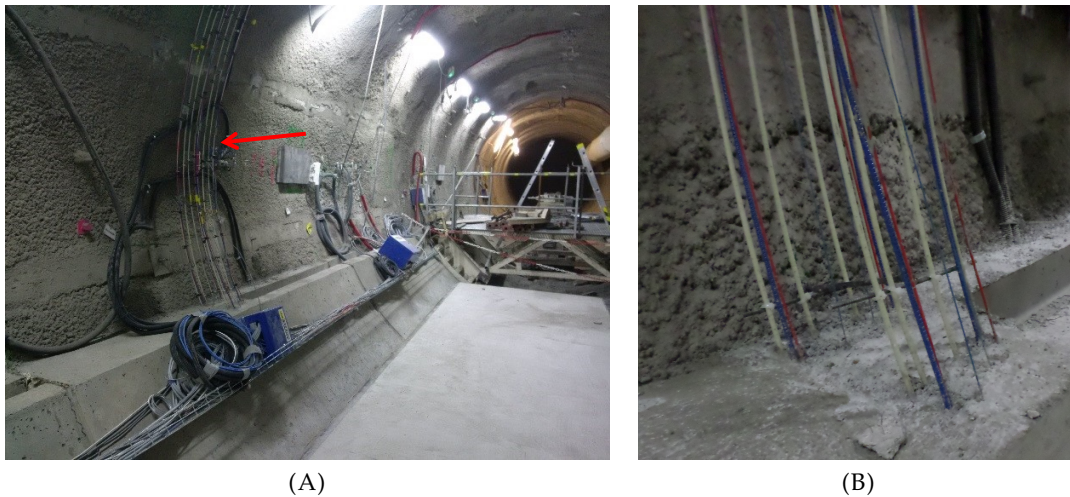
GER concrete pouring: the invert is firstly poured, fixing the position of the cables (A). Example of a difficult cables' installation in the CMHM laboratory (B).
